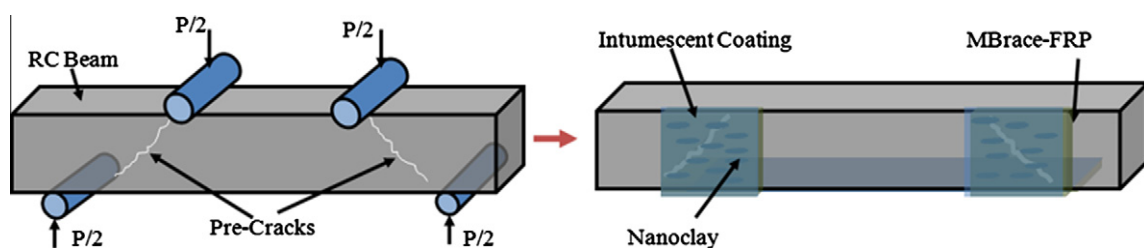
Schematic of new fire resistant FRP repaired concrete beam.
